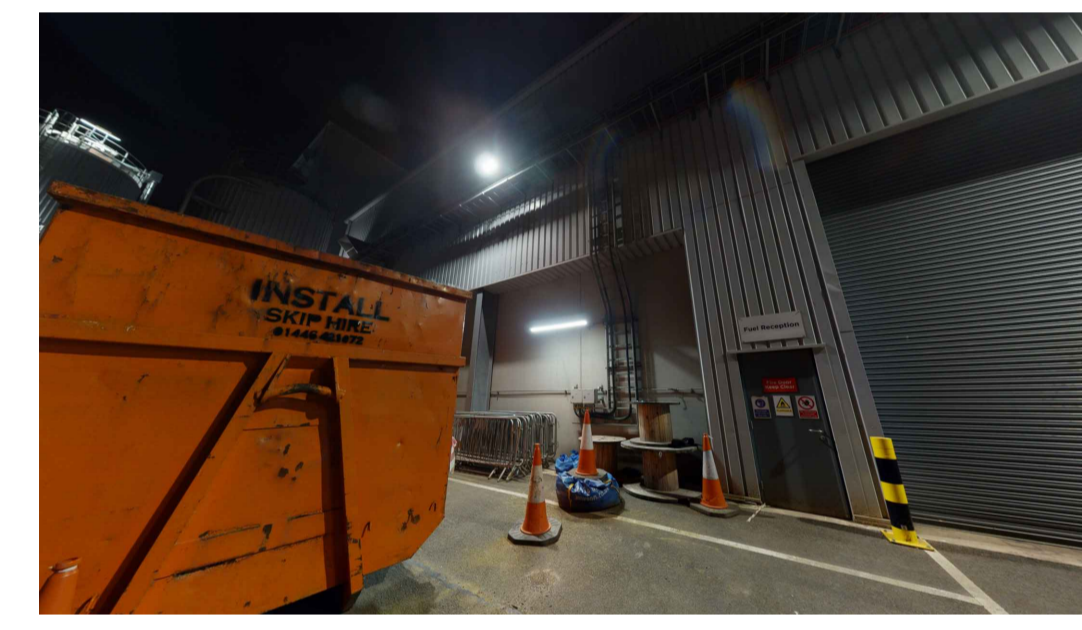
showing recessed batten luminaires at 3.0m underneath Wood Processing Building cladding in addition to floodlight at 7.5m
